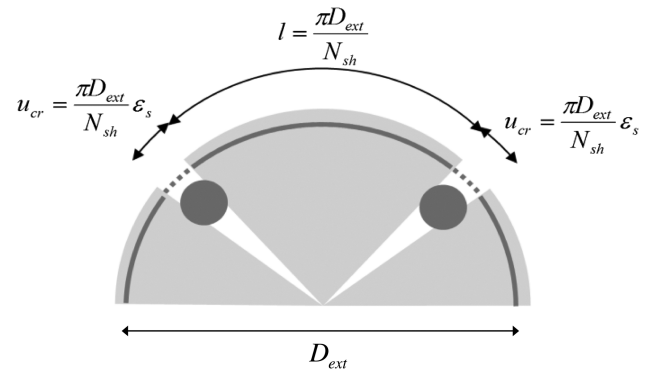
Splitting crack opening and strain in hoop reinforcement
